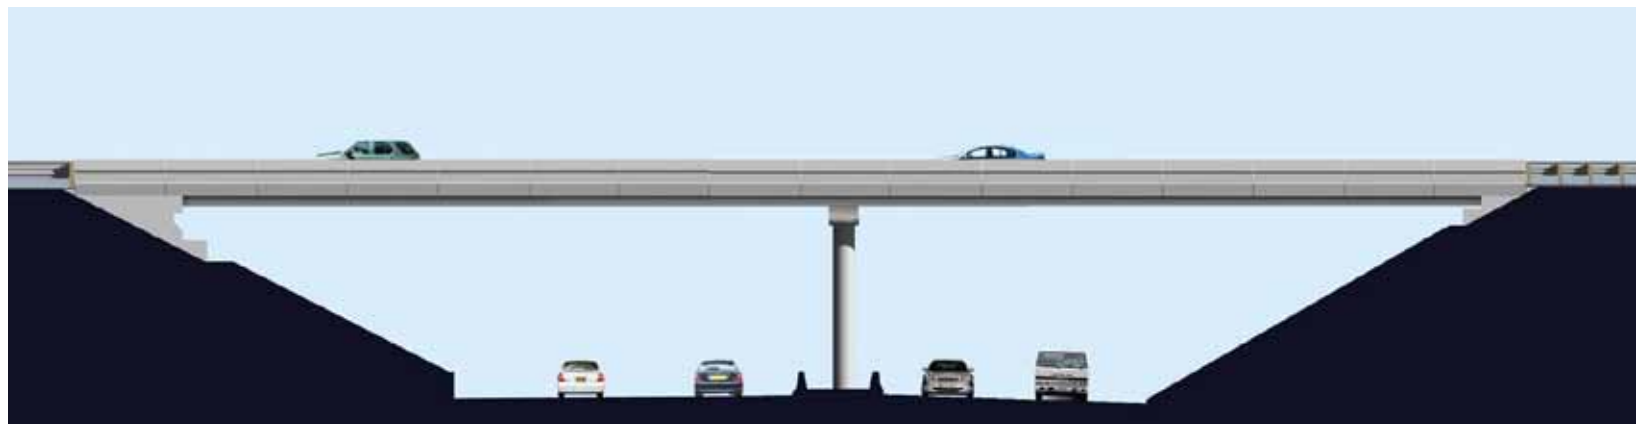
Elevation of Curletts Bridge showing section cut through motorway corridor
